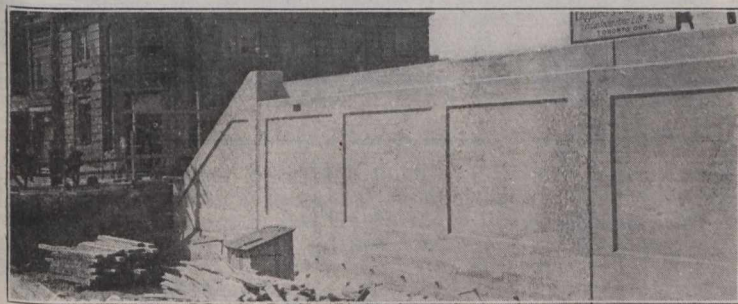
West Abutment Wall of Yonge Street Subway.
